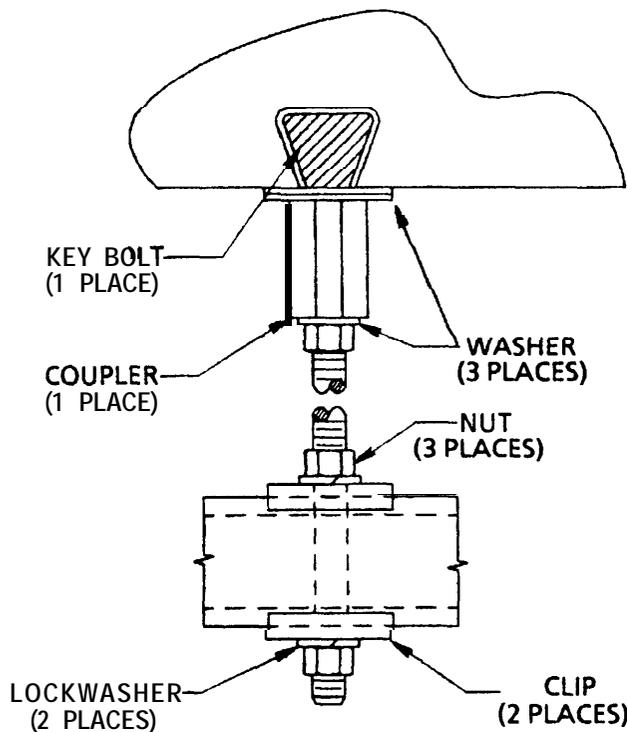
Typical Threaded Rod from Two-Bar Channels to Keystone Ceiling.
